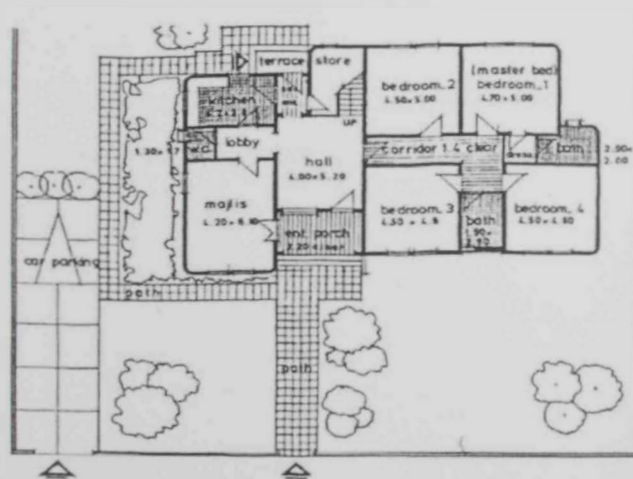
Floor Plan of Sample Houses in 1980's Source: Ministry of PW&H 1988 (Cited in Al Mansoori, 1997)
